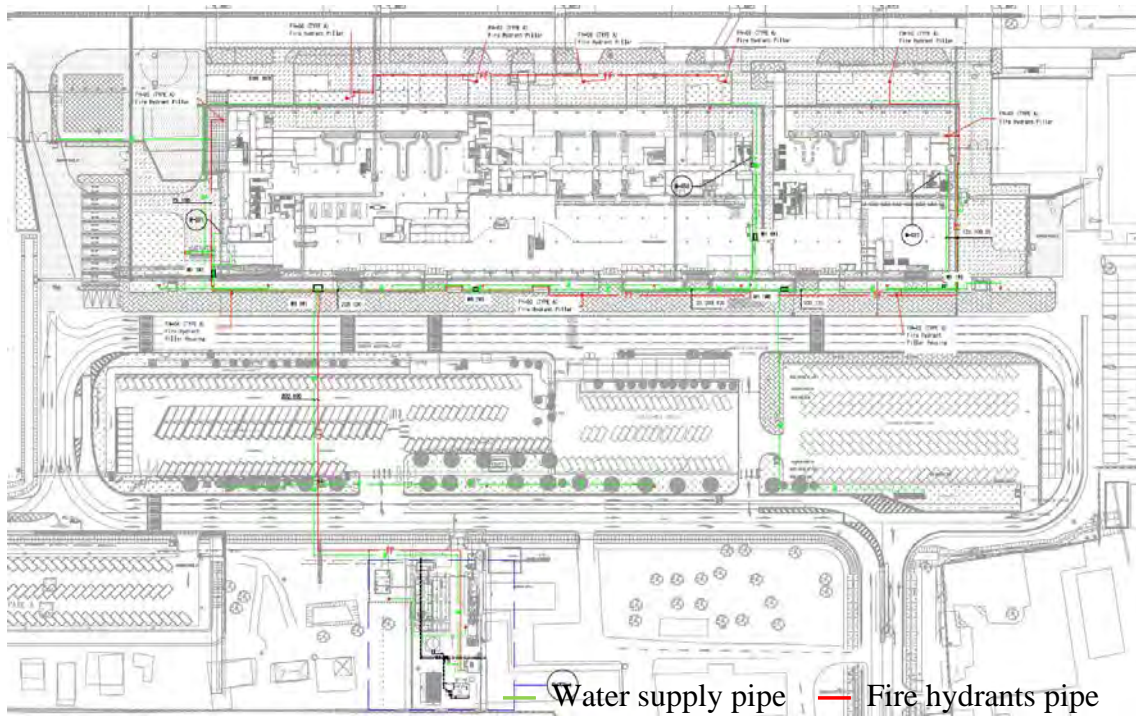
Location of the Water Supply Pipe and Fire Hydrants Pipe
